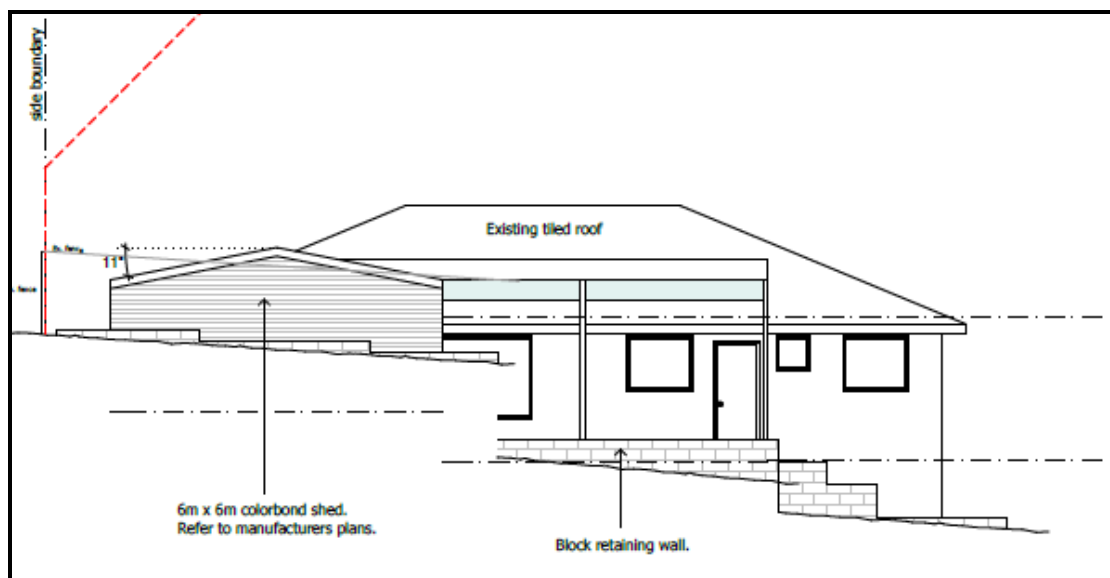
A snapshot of the south-western elevation, which is the view of the proposal from the dwelling to the 3 Bundarra Place.
